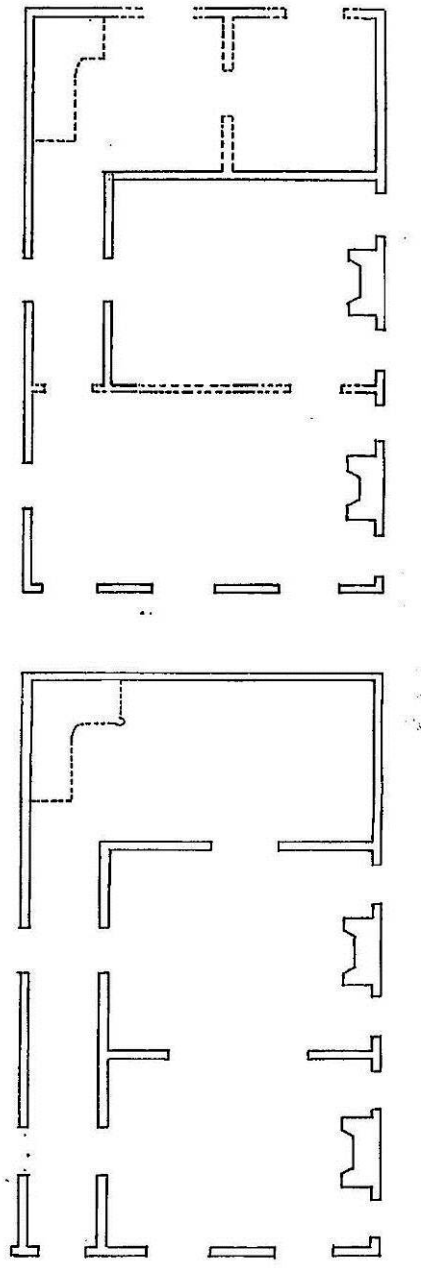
Reconstructed floor plan of 412-414 Burgundy. Reconstructed by Naohito Okude. 1986.
